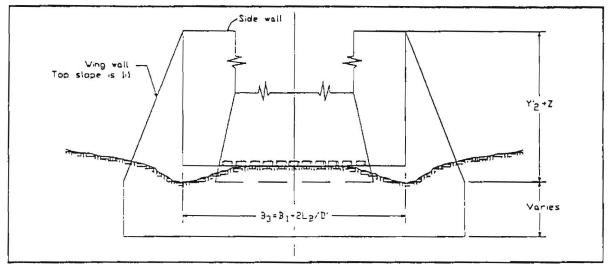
Downstream Elevation of Trapezoidal SAF-Type Stilling Basin
